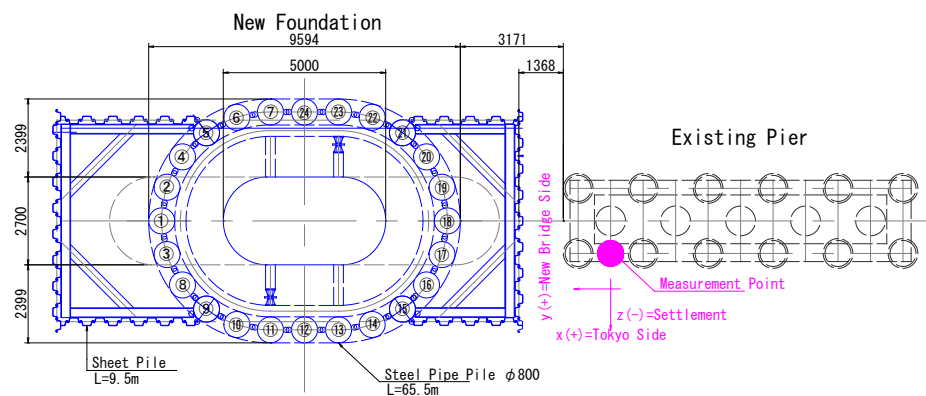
Plan View of the Foundation and Deformation Measurement Point
